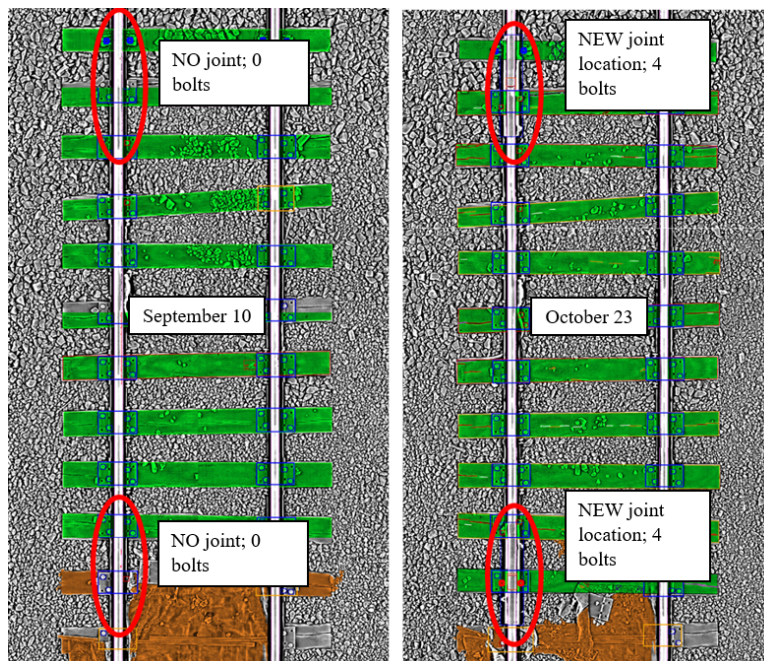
No Joint Bar (Left) and Two Joint Bars (Right)
